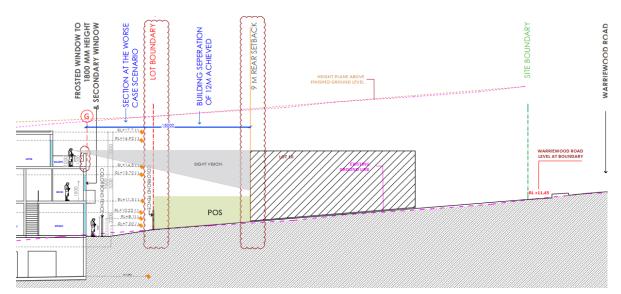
Separation distances and sight lines between the proposed RFB and proposed residential allotments at the Warriewood Road frontage
